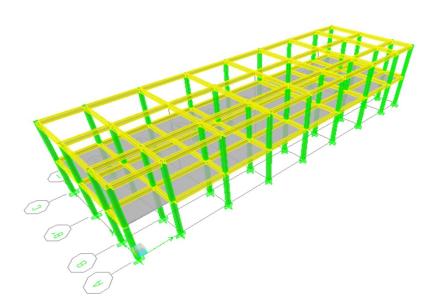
Modeling of existing structures of buildings TK B Source: ETABS V9.7.4
